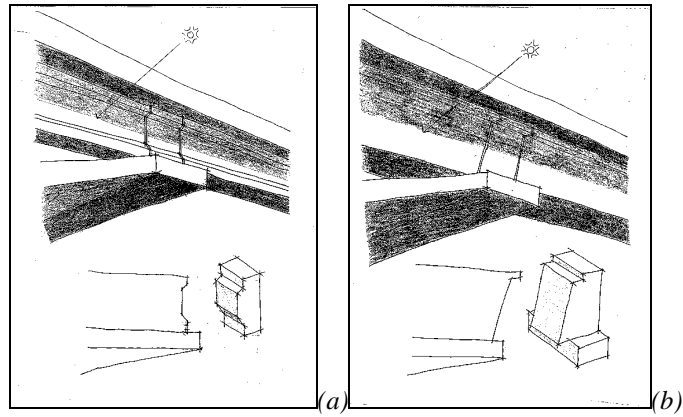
Bent cap ends formed to match the shape of concrete I-girders (a) and U-beams (b)
